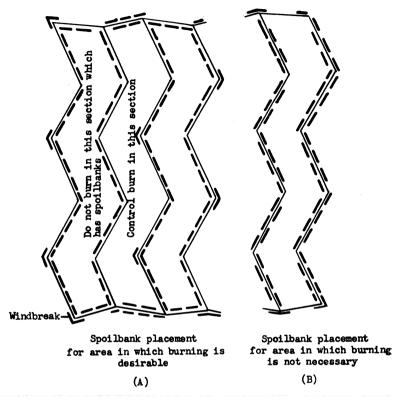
Proposed ditching lay-outs and spoilbank placement.
